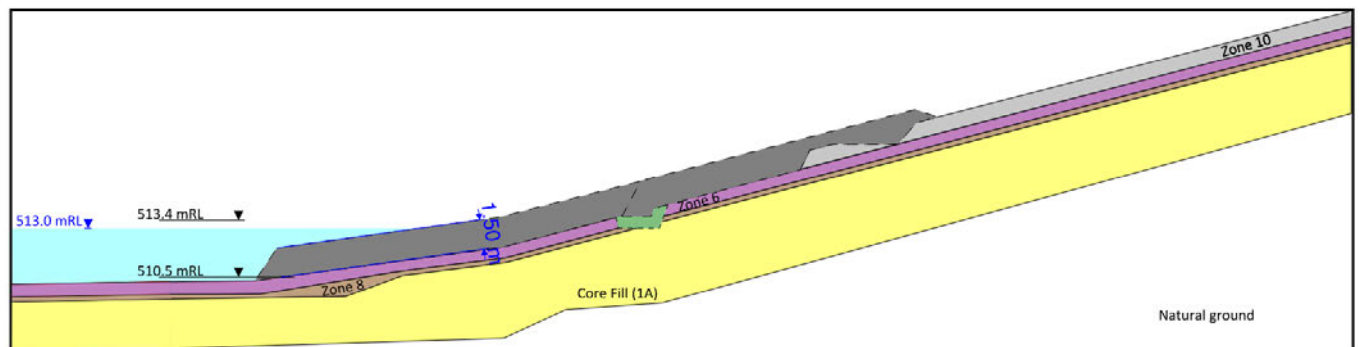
Schematic sketch – Tranche 2 – abutments – placement of rip-rap and backfilling of construction bench – Not to Scale
